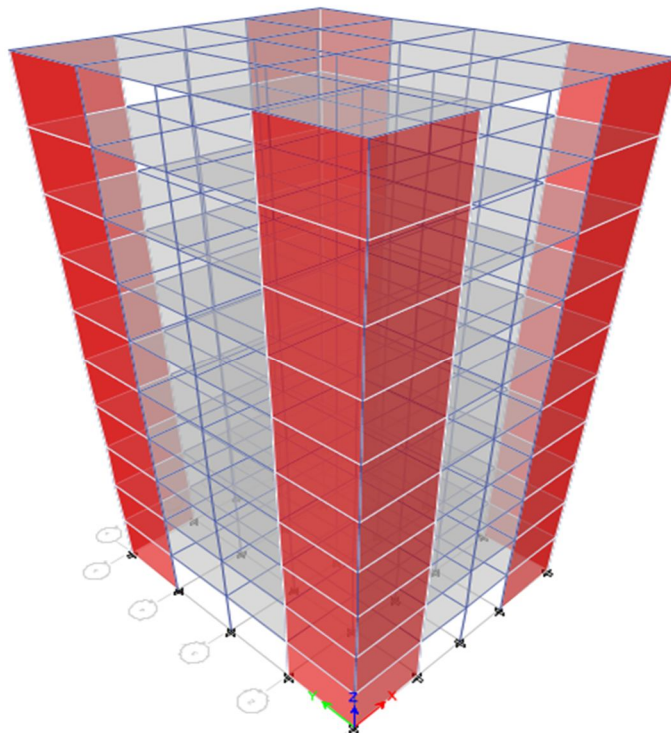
10 FLOOR BUILDING WITH SHEAR WALL
